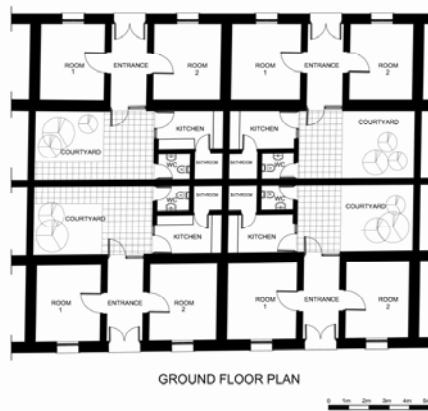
Typical ground floor plan of Samanbahçe Social Houses (Evkaf Documents, 2004)
